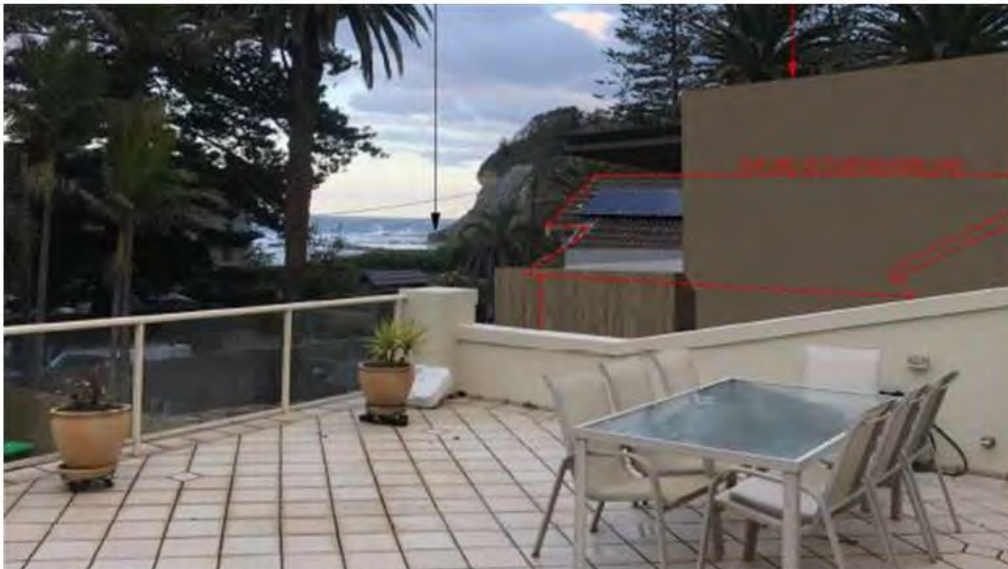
An extract of the applicant's photomontage using the assessing officer's photo in figure 14.
